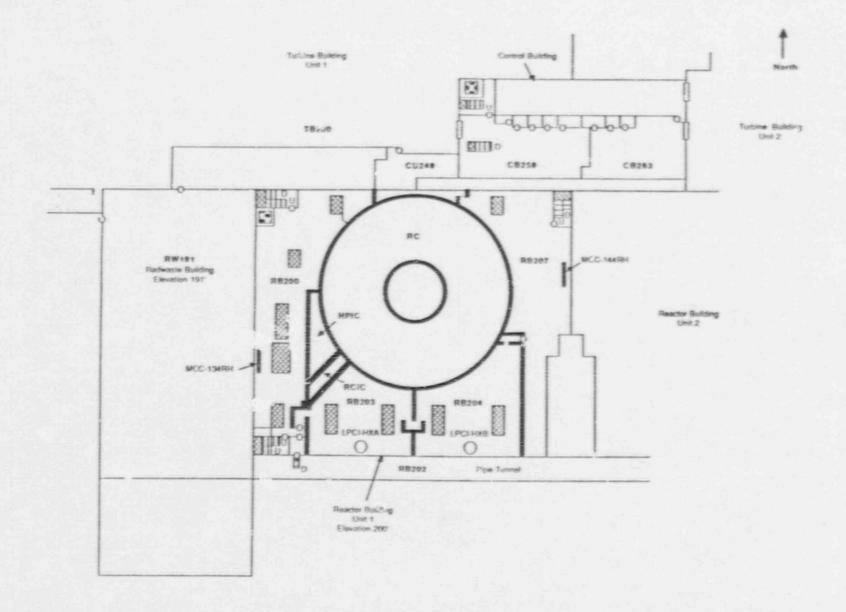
Limerick 1 General Arrangement, Elevations 191' and 200'
